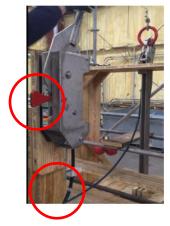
The release handle is in the locked and closed position. However, the cable is damaged.
